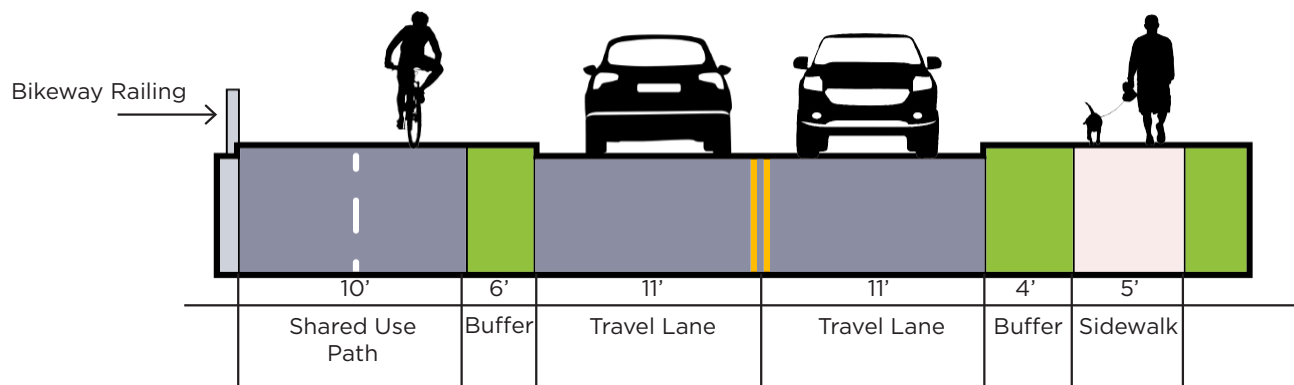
Riverside Drive Proposed Section - Long-term (looking northbound)
